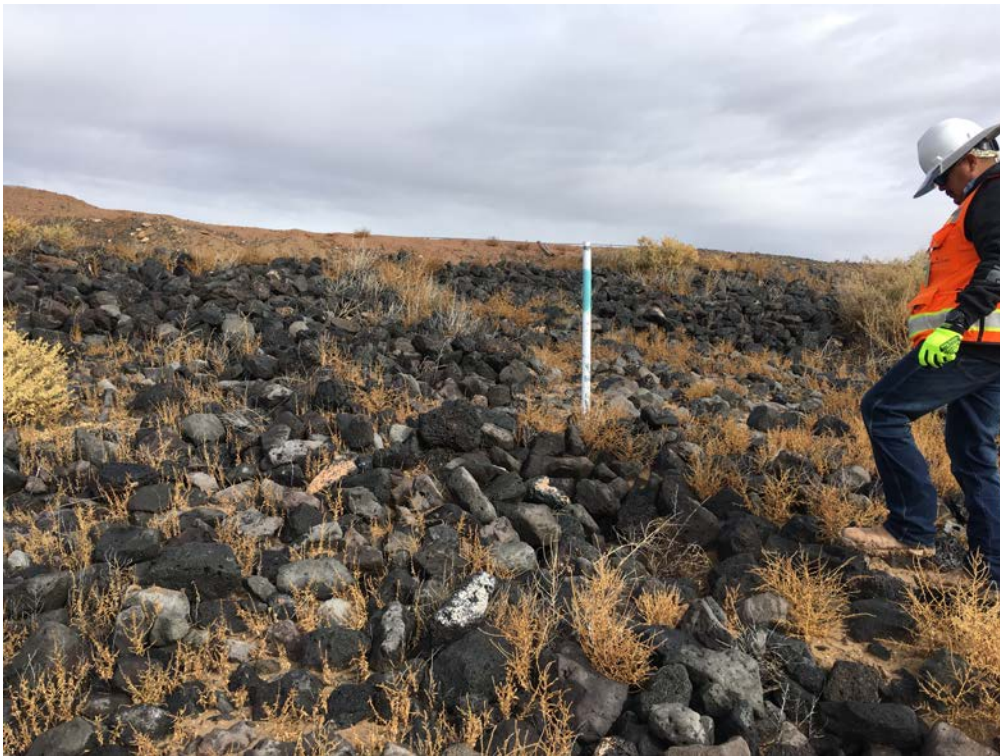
LTP, approximate location on downstream slope of south embankment where the sinkhole daylights downslope
